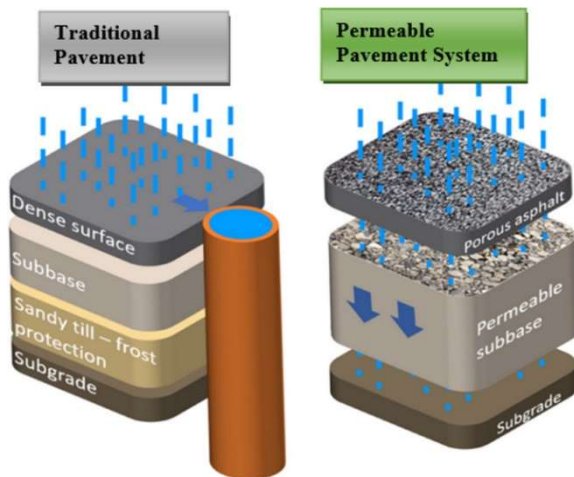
Permeable pavement systems as best management practices for stormwater runoff control
